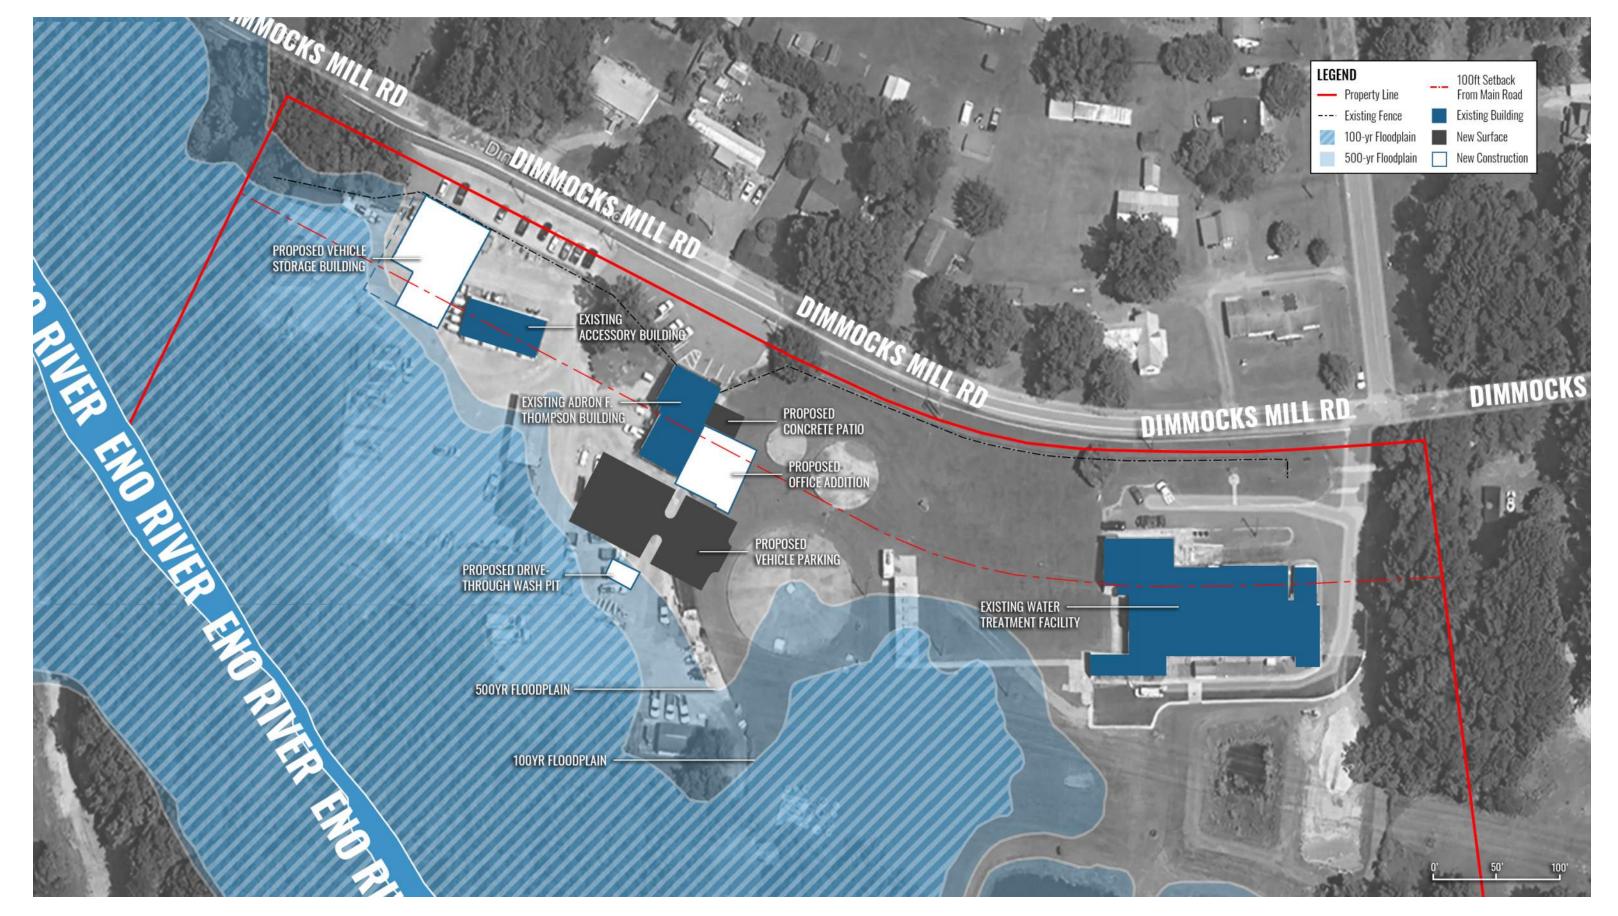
EXHIBIT A - All Proposed Development Outside 100yr Floodplain
